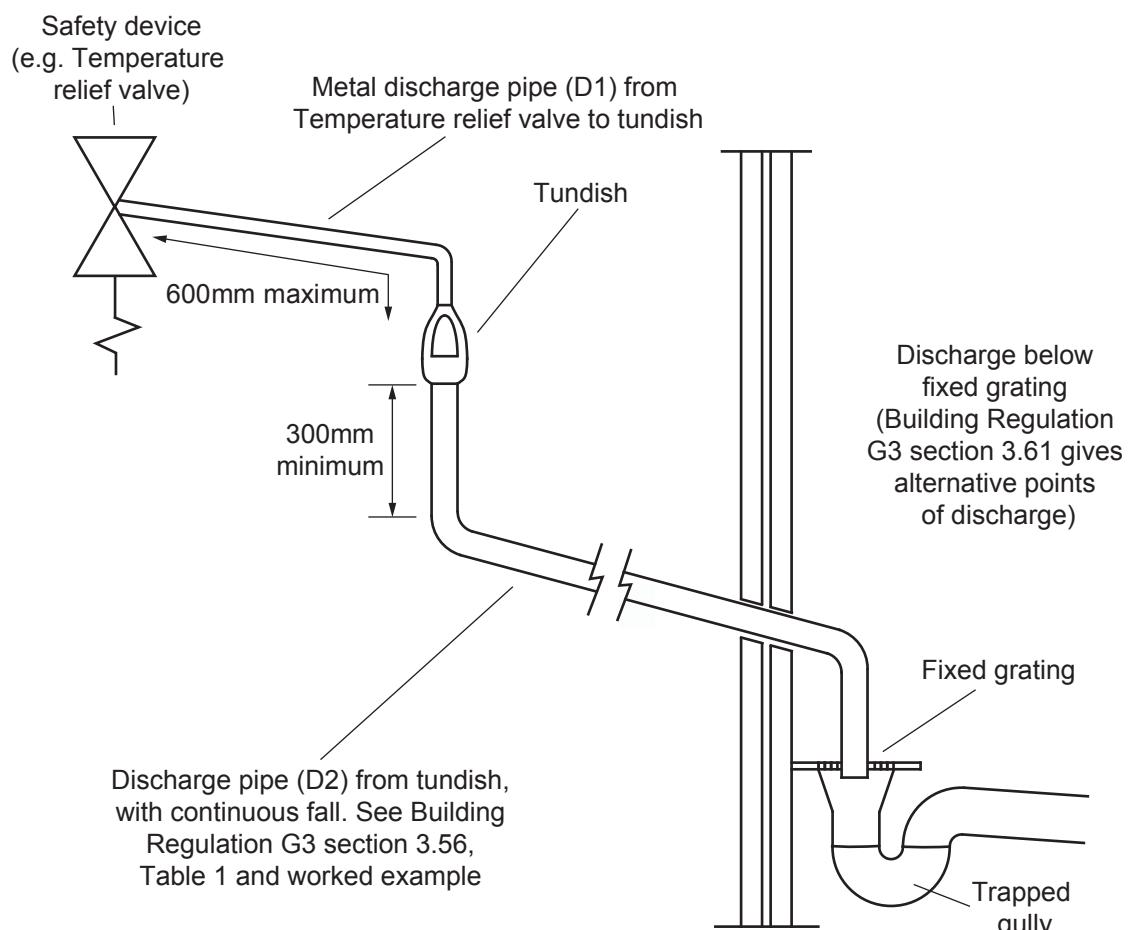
Typical discharge pipe arrangement (extract from Building Regulation G3 Guidance Section 3.50)
